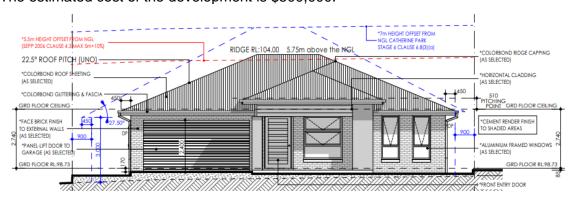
Proposed front elevation (blue dash line relates to building envelope).
